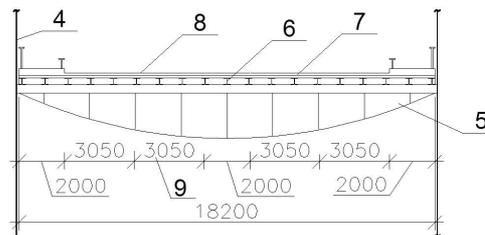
The bridge cross-section cut A-A: 4 – suspensions; 5 – composite trussed beam; 6 – composite I type beams; 7 – composite plank; 8 – cover of the bridge; 9 – lines of the bridge
